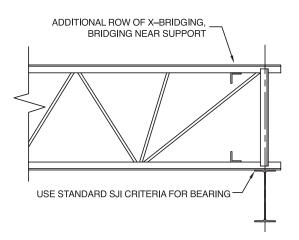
SQUARE ENDED, BOTTOM BEARING
